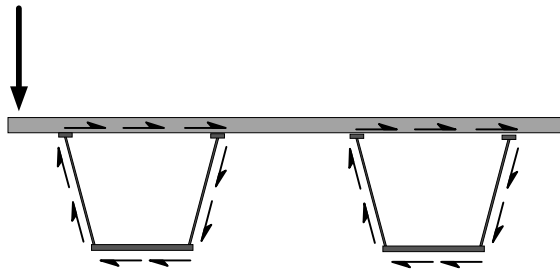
Cross-Section of U-Shaped Girder Segment (Gilchrist, 1997)
